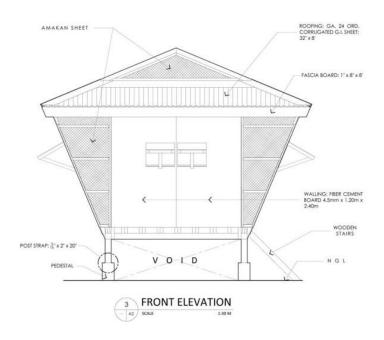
Front Elevation. Shown here with the elevated stilts and Amakan Sheet for added ventilation.
